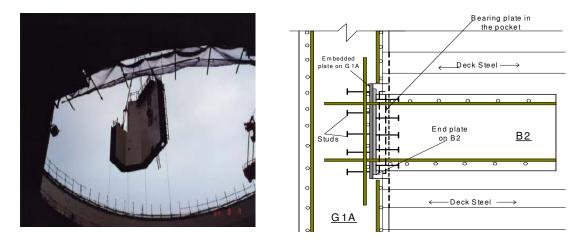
SC-wall-module precast-beam and deck-steel joint connection example
